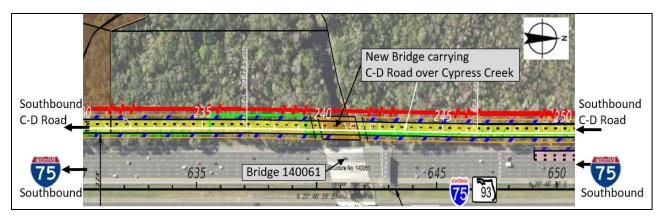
Alternative 2B-New C-D Road Bridge over Cypress Creek
